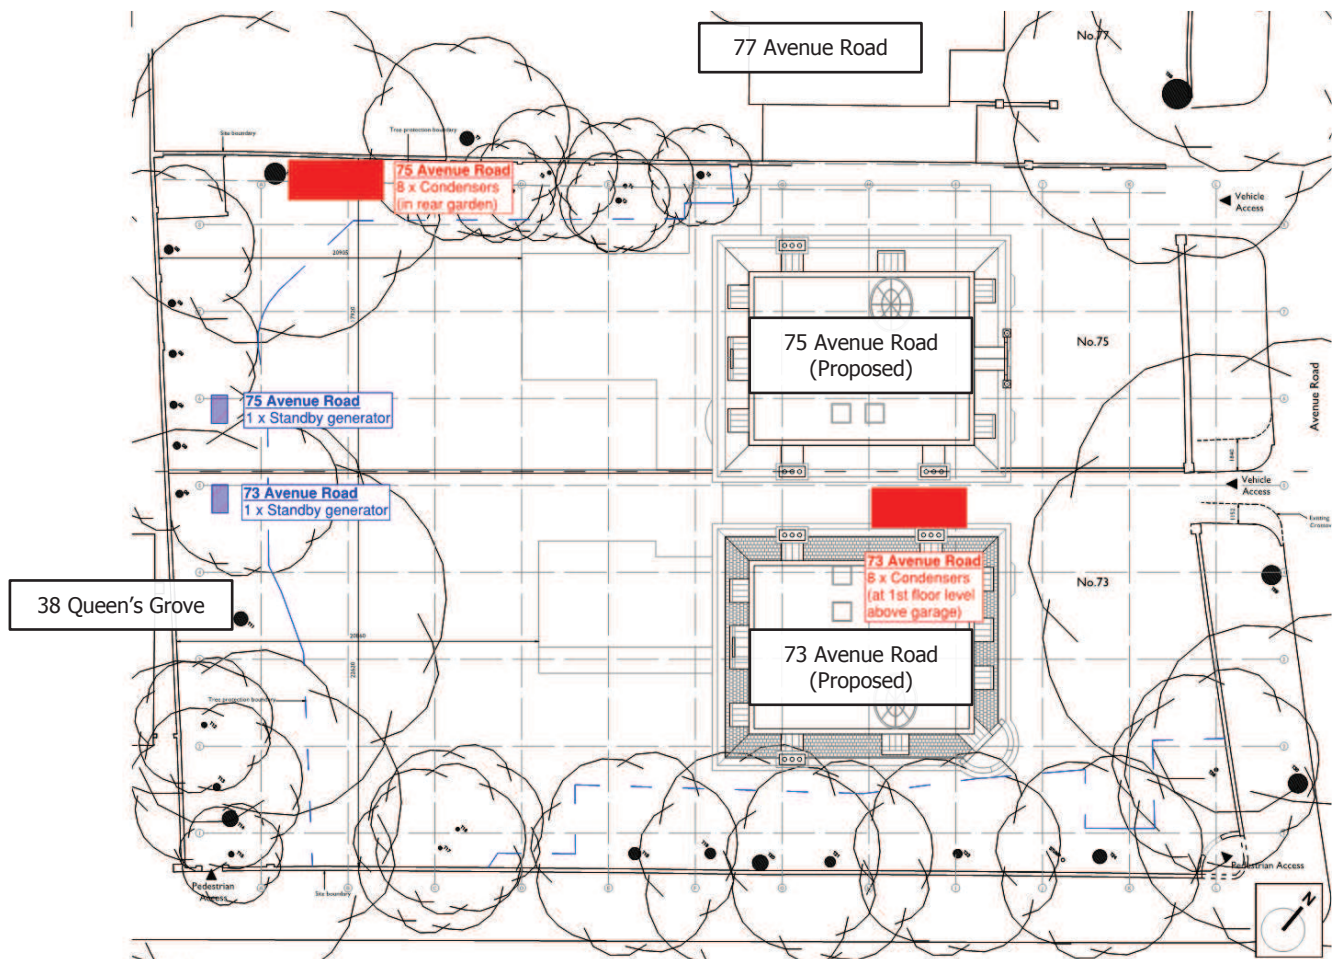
Plan showing proposed plant locations and nearest residential housing
